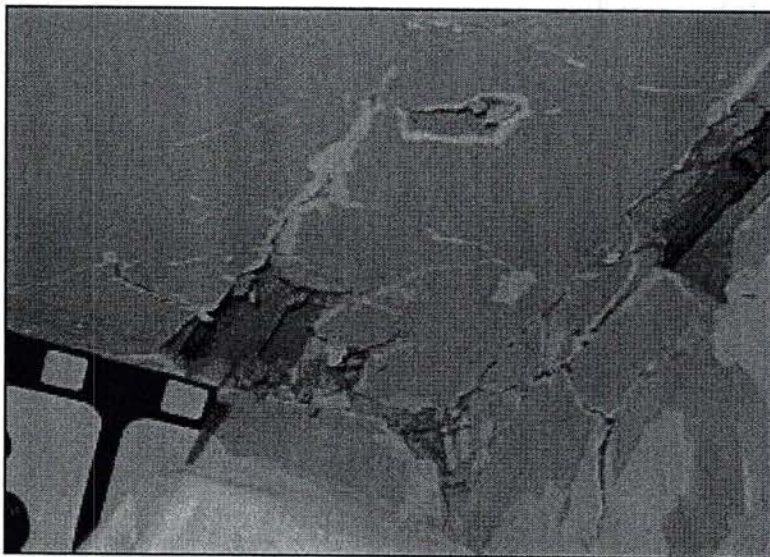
Damage to plaster ceiling and walls in the northwest corner of Room 207 reveals that the plaster is original.
